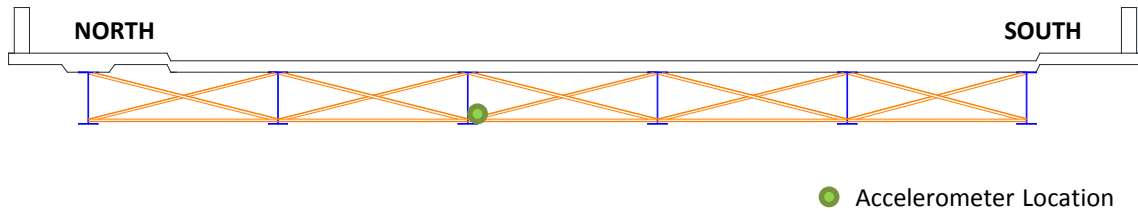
Cross-section view of the TX-71E Bridge showing typical accelerometer location on the bottom flange of an interior longitudinal girders.
